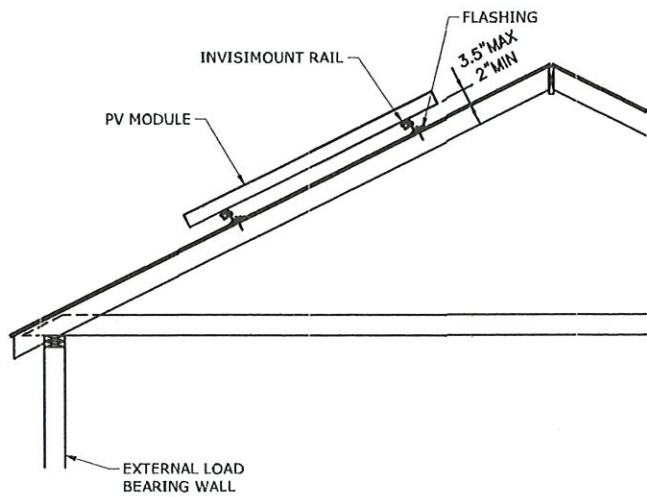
ROOF 2 STRUCTURAL FRAMING DETAIL
